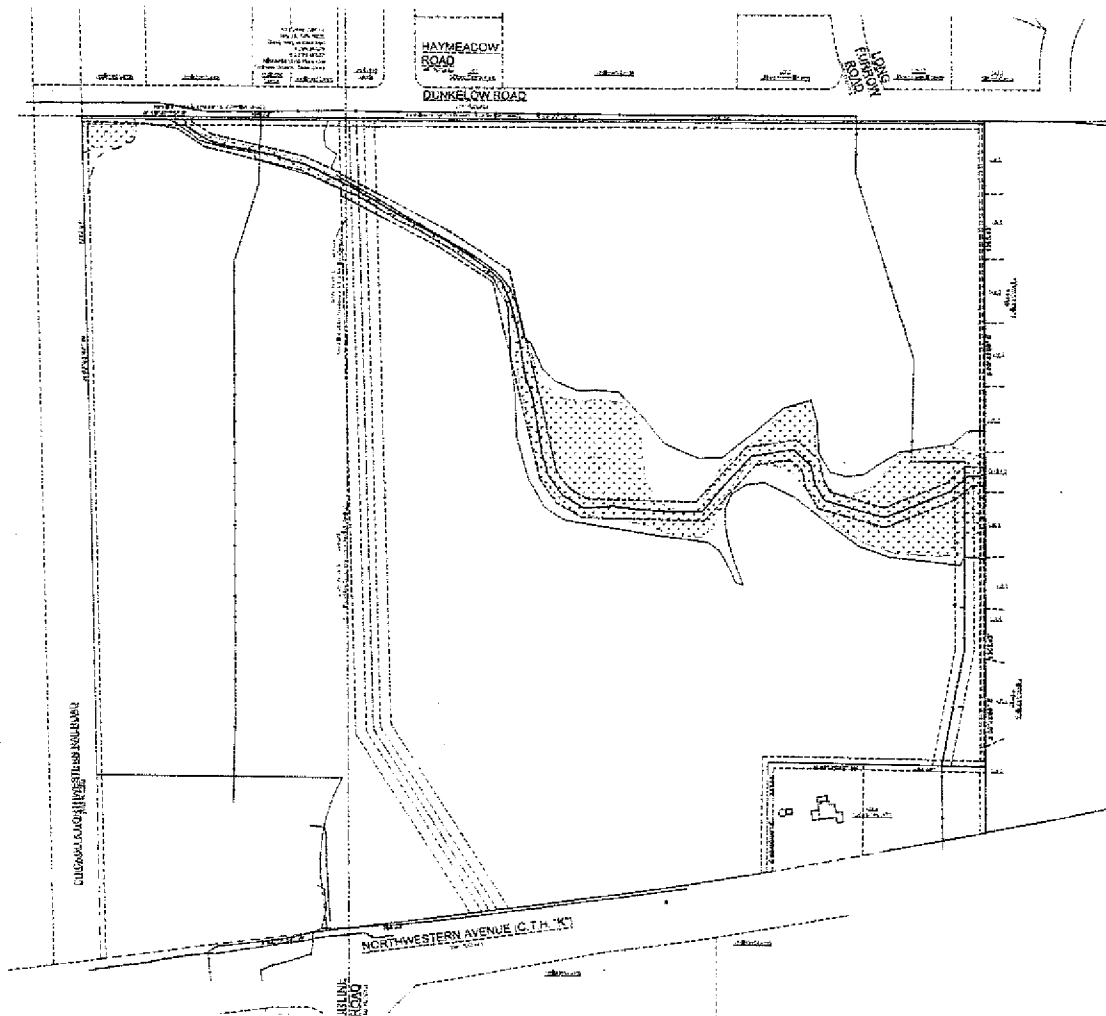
Exhibit B – Wet Pond Overall Drainage & Grading Plan
